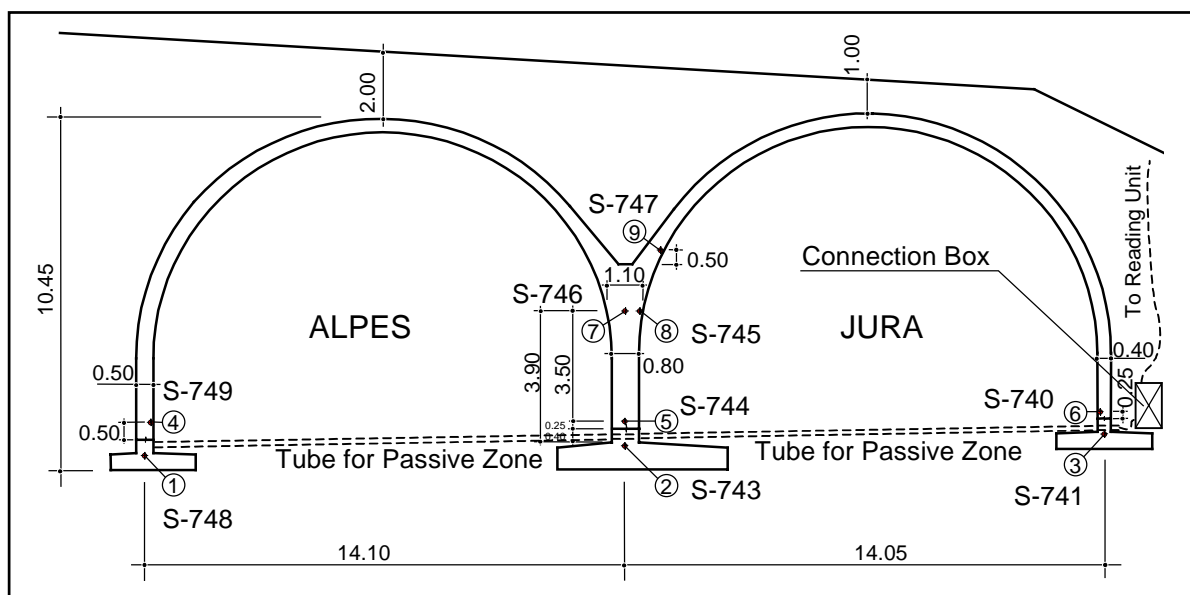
Cross section and sensor equipment of the cut-and cover tunnel Champ Baly [5]
